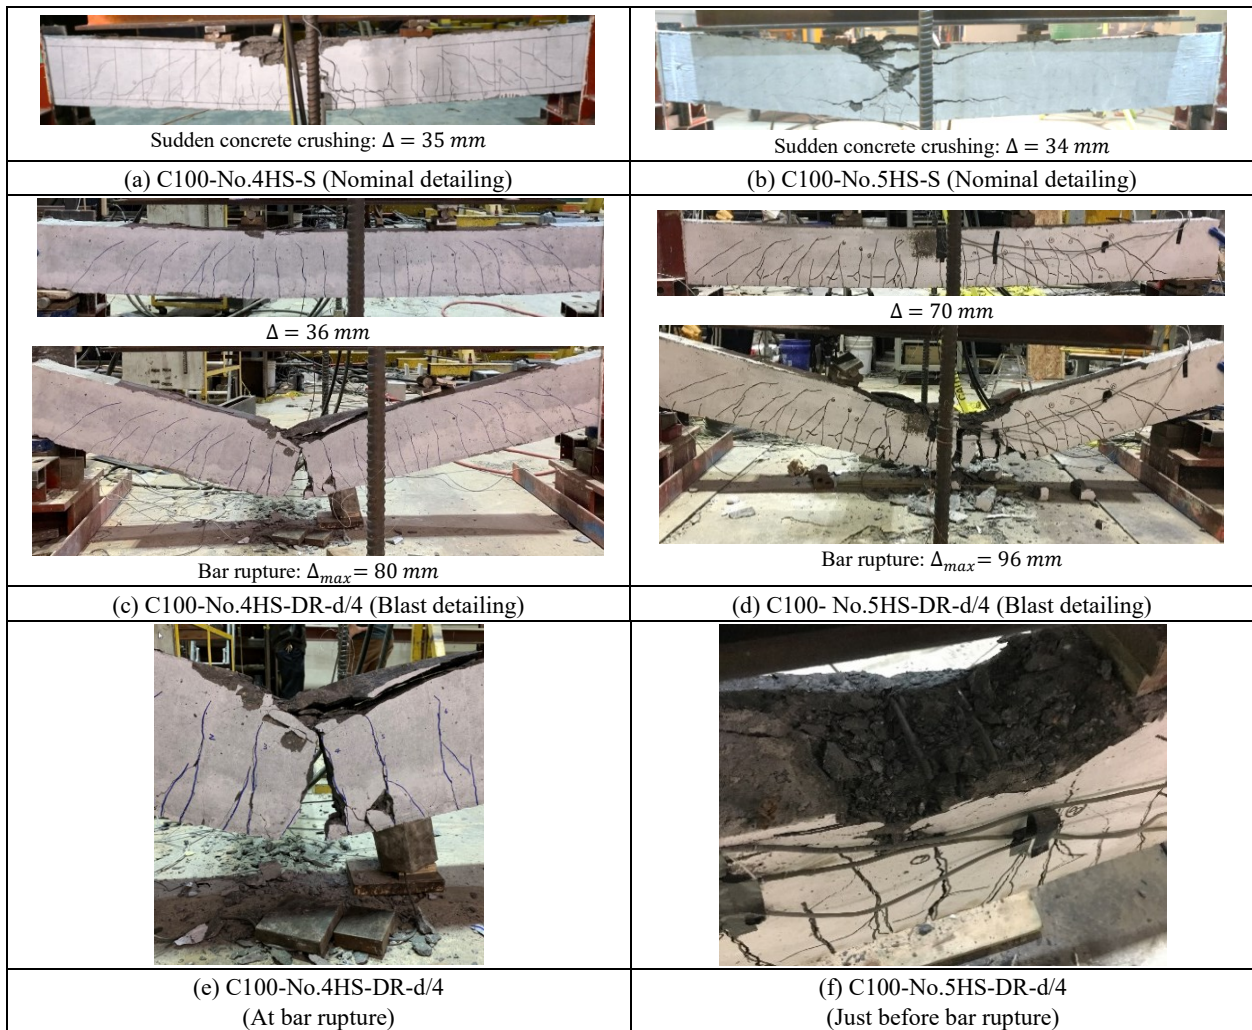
Damage/failure modes under static loading: effects of detailing
